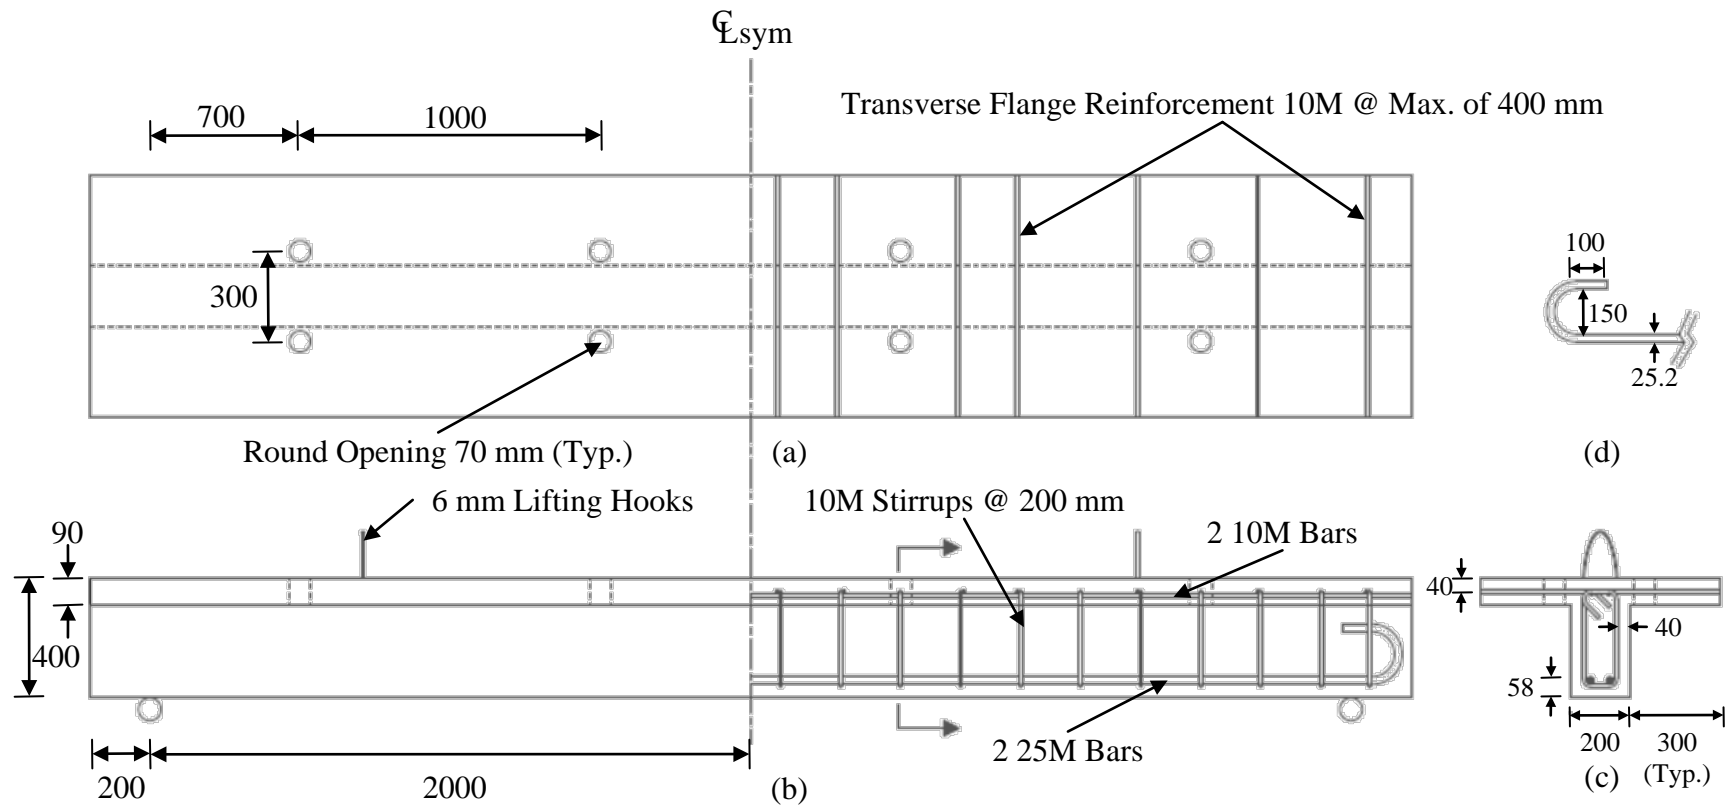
Control Specimen with Reinforcement Details: (a) Plan (Note: Web Reinforcement not Shown for Clarity), (b) Elevation, (c) Cross-section and (d) 180° Standard Hook Detail for Flexural Reinforcement (All Dimensions in mm).
